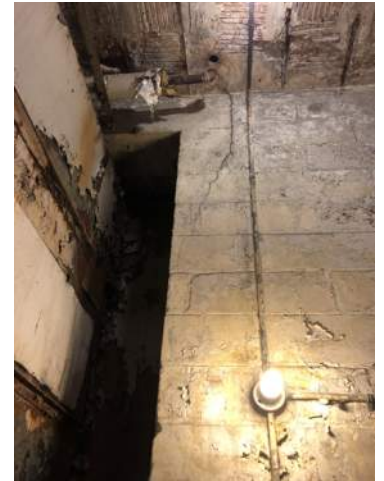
Interior B House Blower Fan Room North Wall vertical crack
